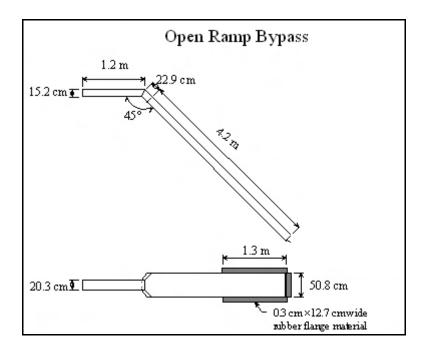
Dimensions of the open ramp bypass design (side view above and top view below) installed at the Bradford Island MWC in 2002.
